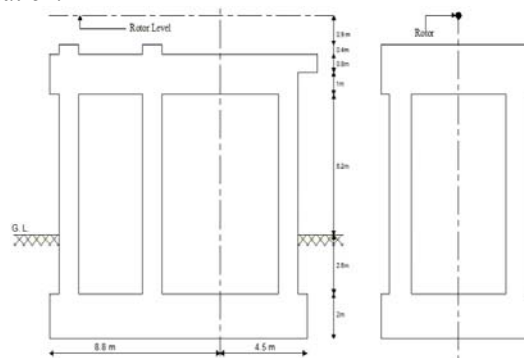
Section A-A: - Elevation of the TG Foundation and Section B-B: - Side View
